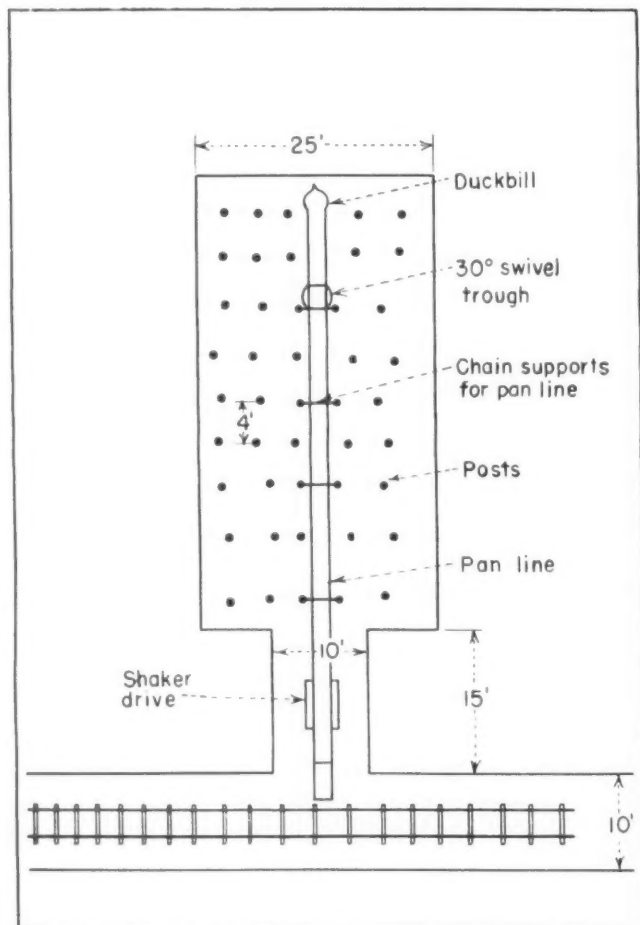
TIMBERING AND ROOM WORK with duckbills at Eagle.
